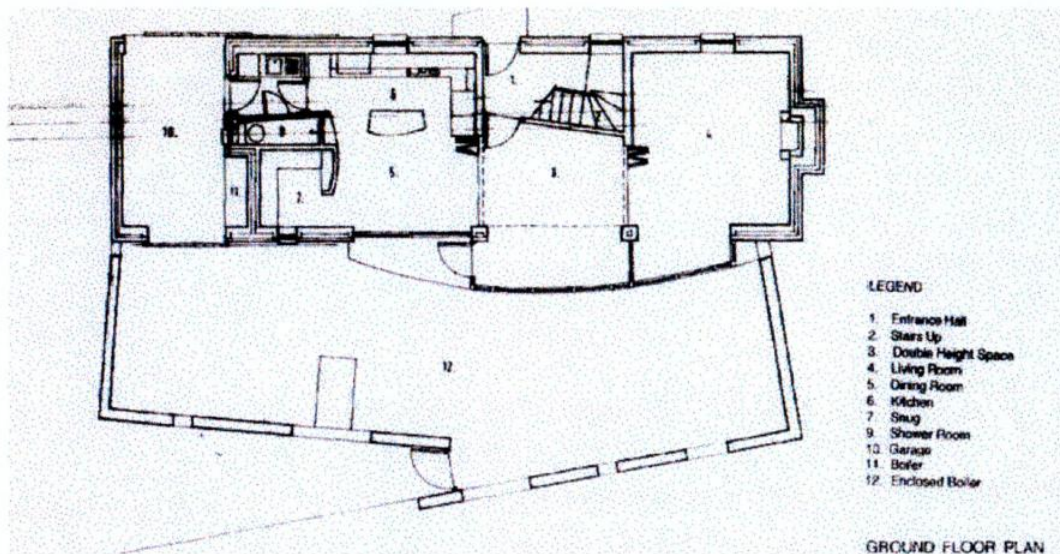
The ground floor plan of the house, showing the windscreen at the back of the house.
